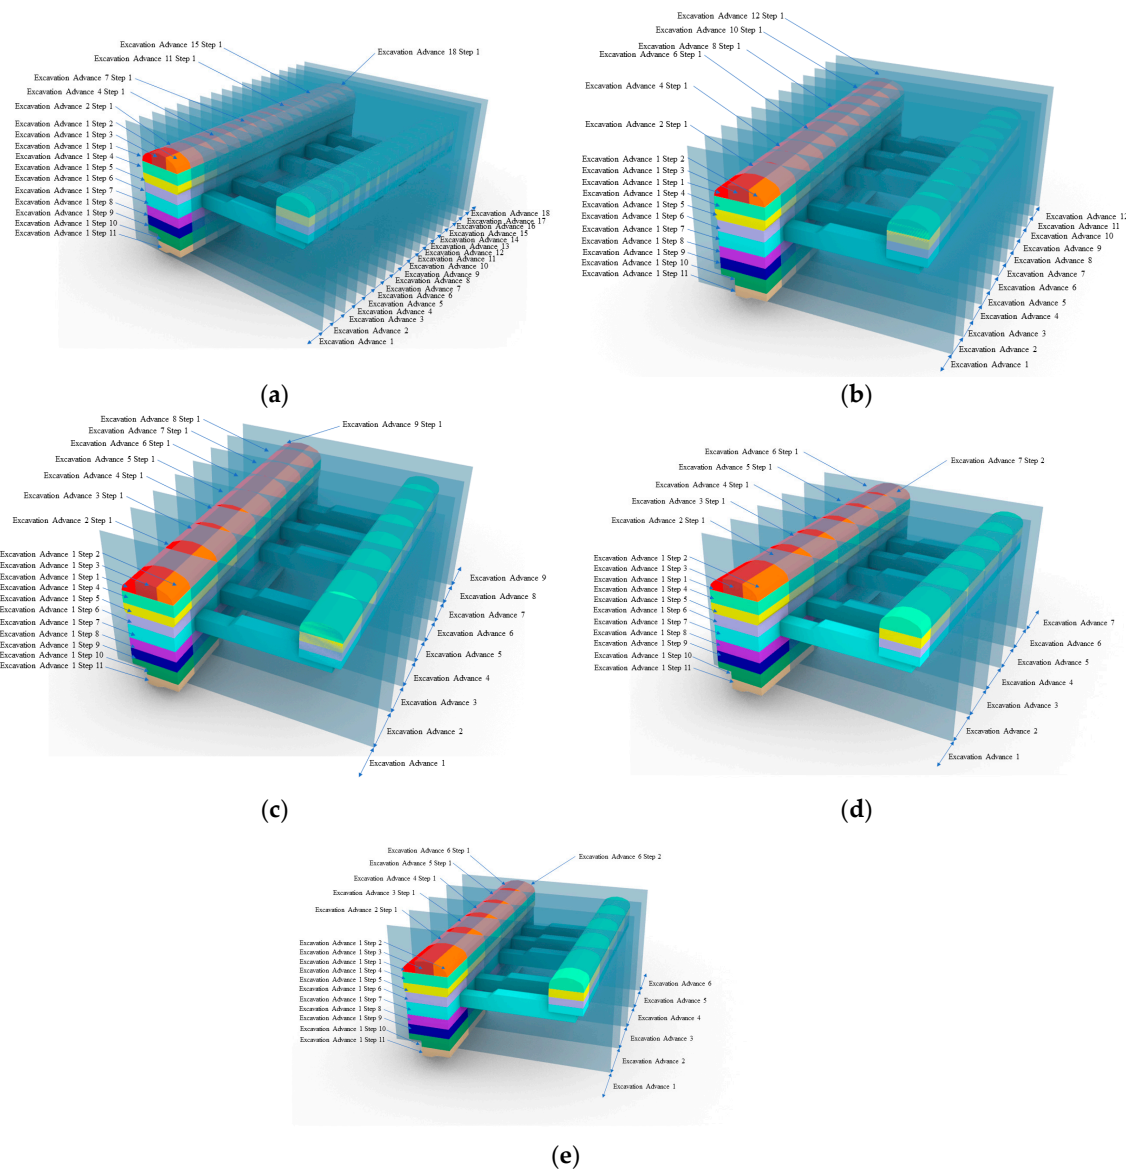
Different excavation advance models. (a) Excavation advance: 10 m; (b) excavation advance: 15 m; (c) excavation advance: 20 m; (d) excavation advance: 25 m; (e) excavation advance: 30 m.
